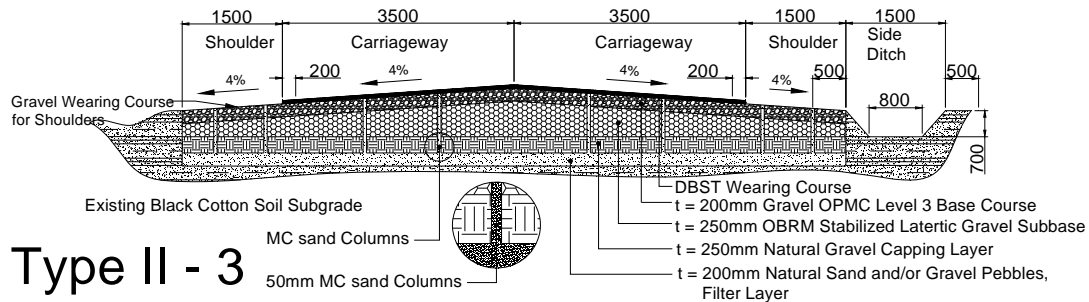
Typical Cross section of Type II-3 of the Juba River Port Access Road depicting typical pavement structure with OPMC Level 5 and OBRM stabilization for Base/Subbase with well improved Black Cotton Soil subgrade constructed in swampy areas under extreme conditions
